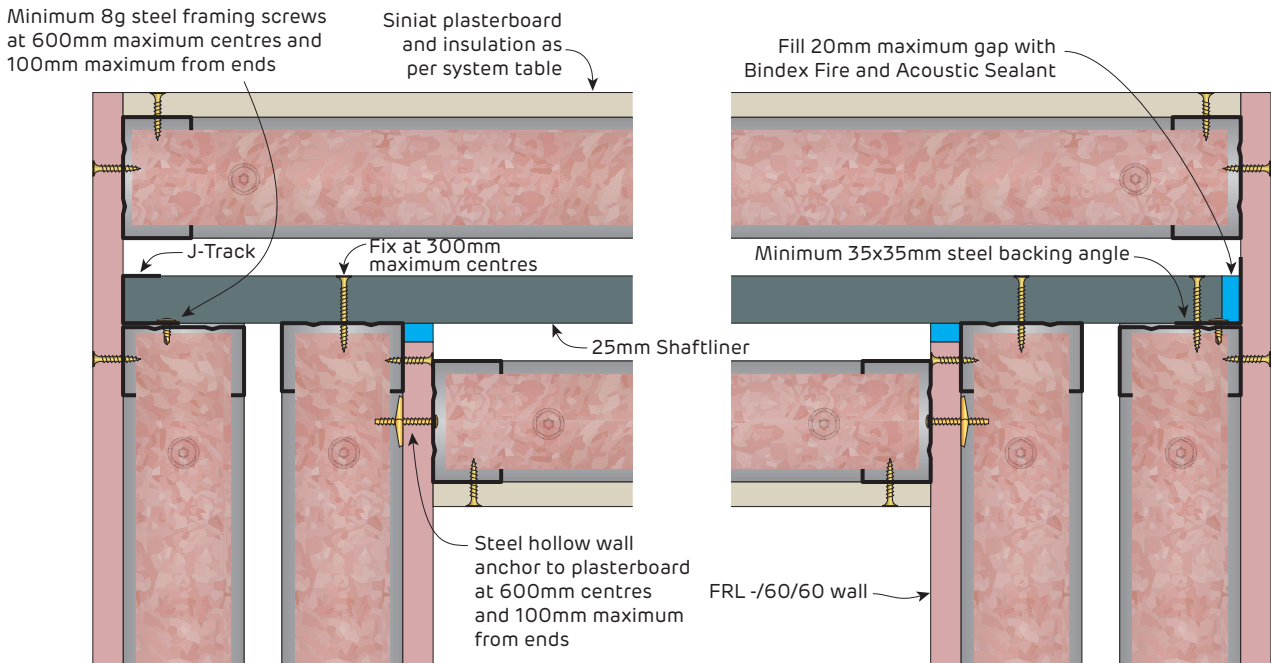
InterHome High-Rise Wall Connection to Fire Rated Plasterboard Wall Plan
